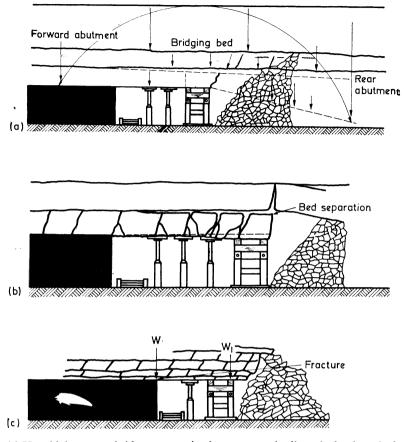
(a), (b), and (c)⁽¹¹⁾ illustrates the principle of the long-wall mining system with full caving of the roof. The immediate roof fractures and falls, and the upper beds are permitted to fracture or bend until they are supported on fallen material.
